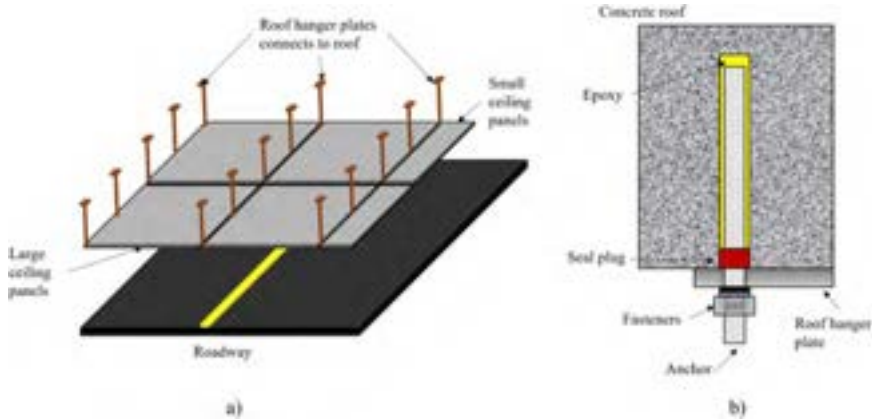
(a) Illustration of D Street portal ceiling construction adhesive anchors. The total mass of material that fell from the roof was approximately 23,500 kg (235 kN), each anchor holding approximately 1000 kg (10 kN). (b) Schematic of the concrete anchors used to mount each panel to the tunnel roof. The anchors attached a steel plate hanger to the roof and were held in place with a construction adhesive.
